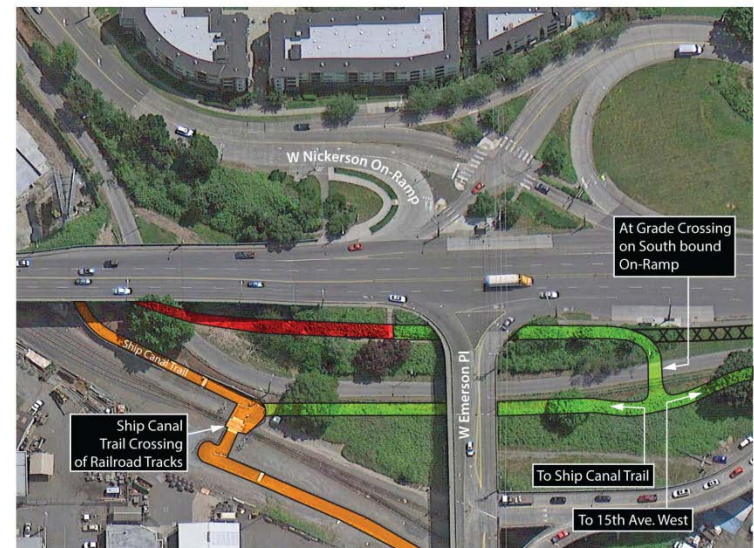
Original Emerson Underpass Trail Concept Drawing as Proposed by SDOT and Modified by BergerABAM
